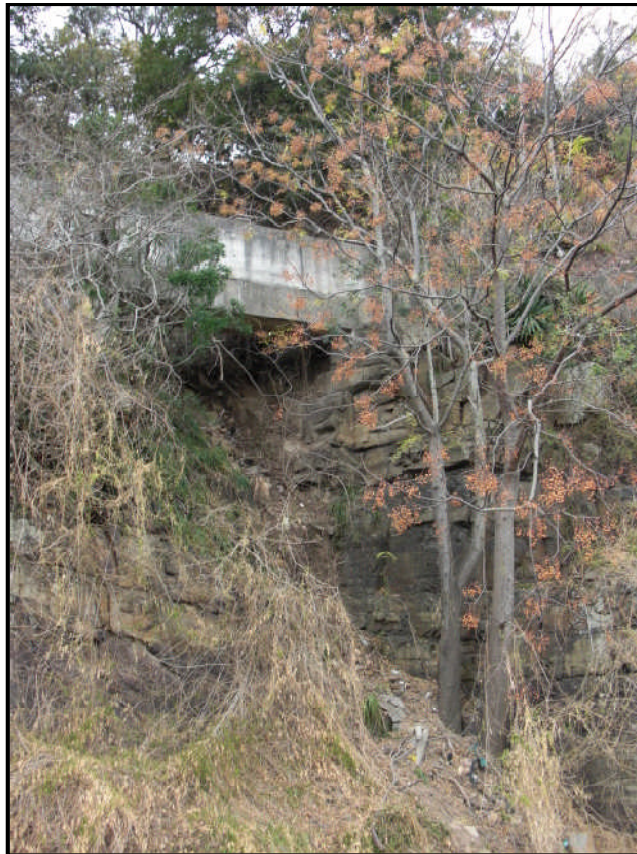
Site S1 - One of the 2 Historic Period walkway bridges
